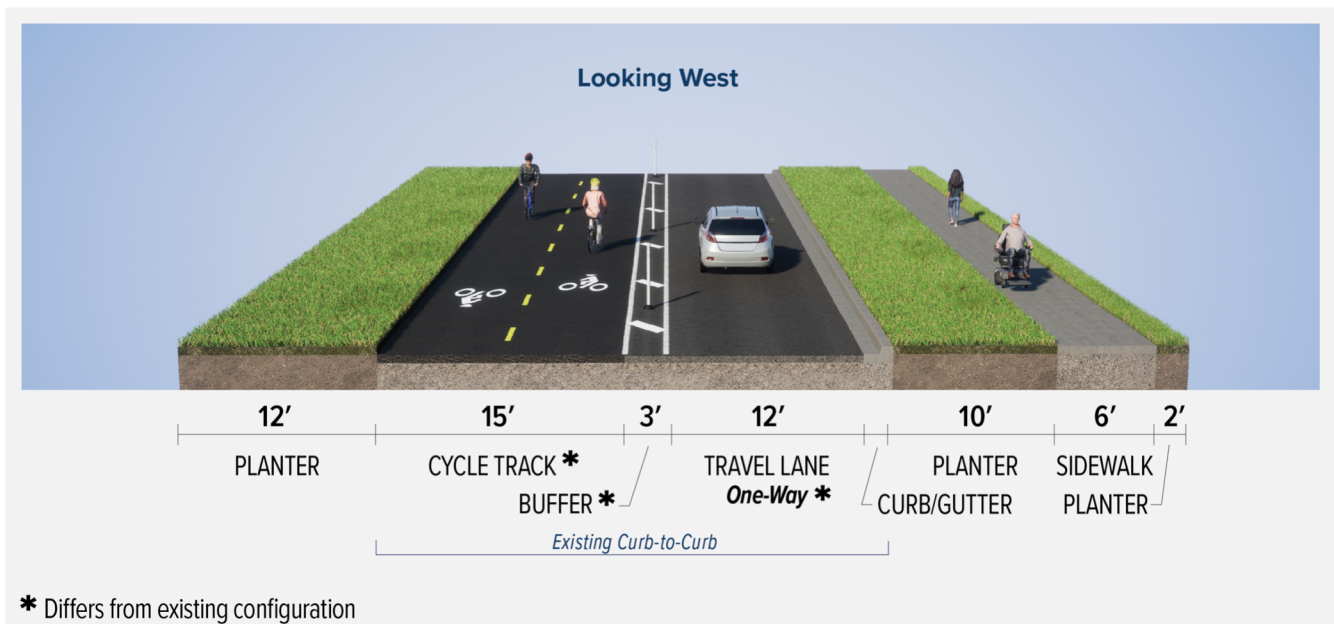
ALTERNATIVE 2 BETWEEN 4TH STREET AND 5TH STREET
